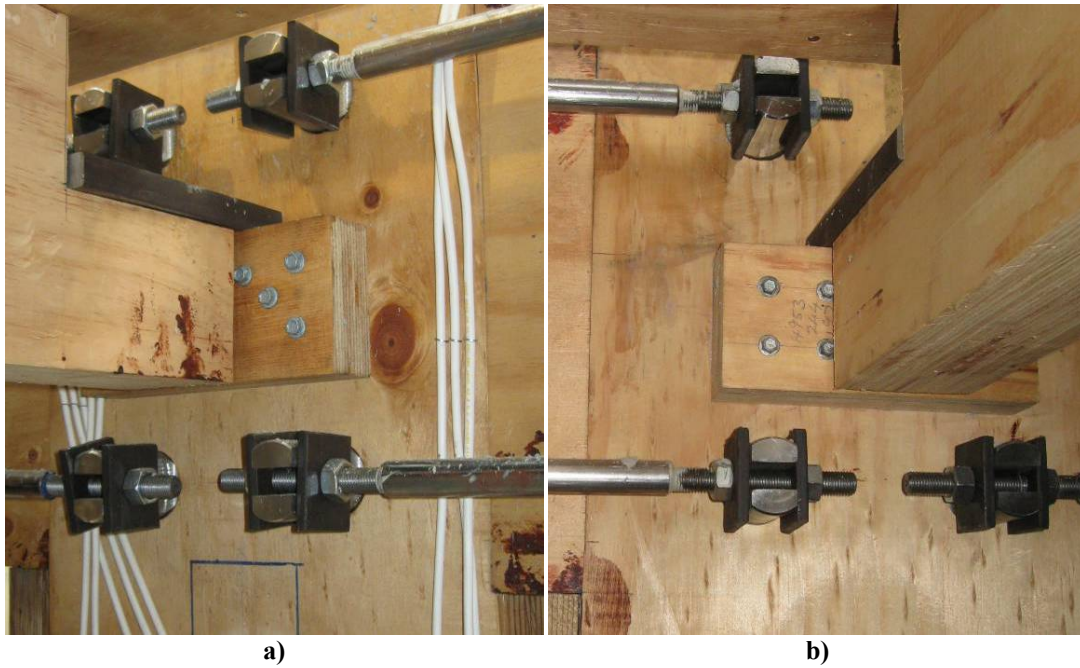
Floor joist support rotation relative to columns at 2% Drift: a) L3 central joist, looking south b) L3 central joist, looking north
